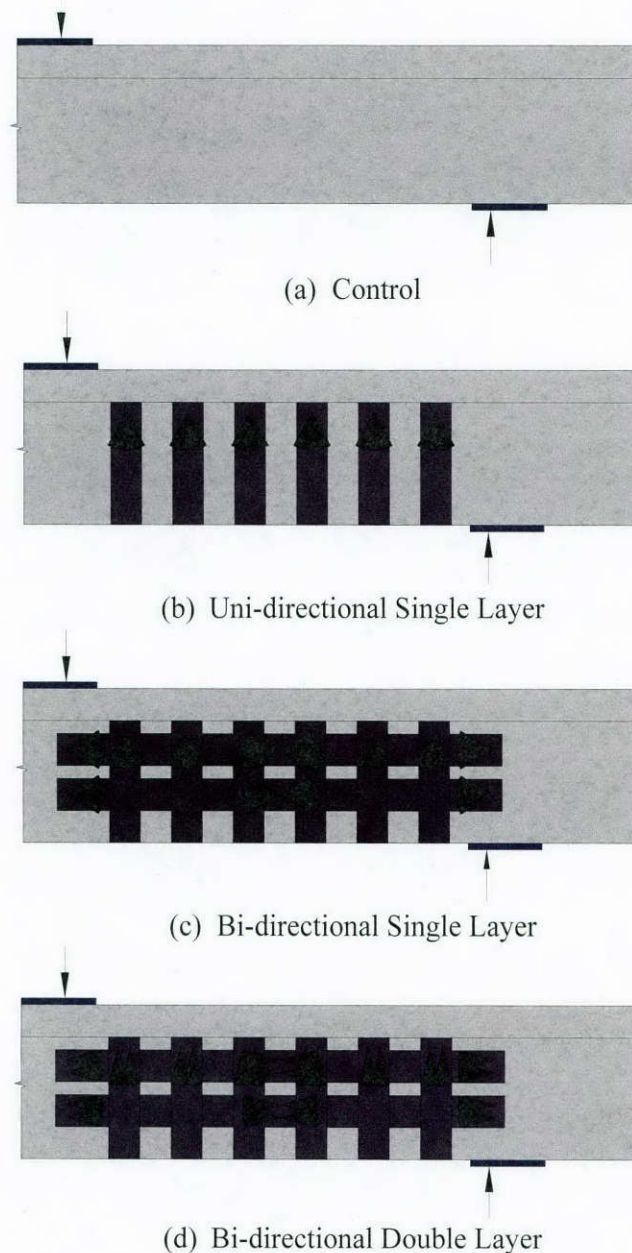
CFRP layouts used in 24-in. T-beams, $a/d = 3$
